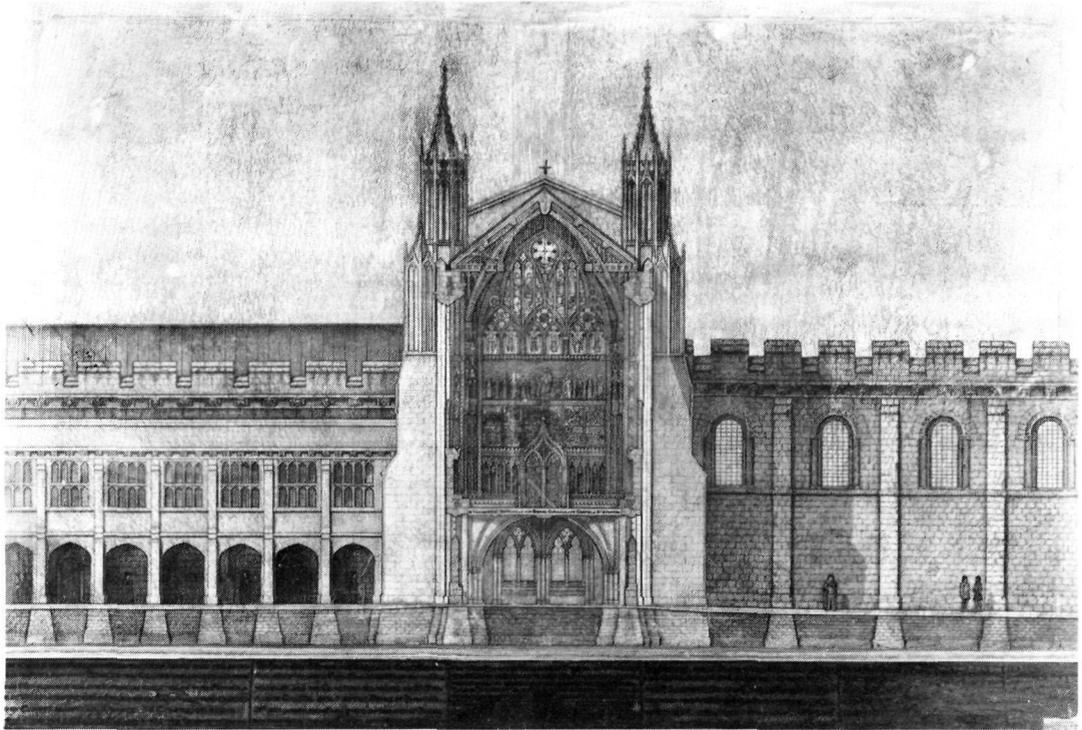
Adam Lee: Transverse section through the west end of the Chapel, also showing cloisters and original Anglo-Saxon wall adjoining Westminster Hall.
